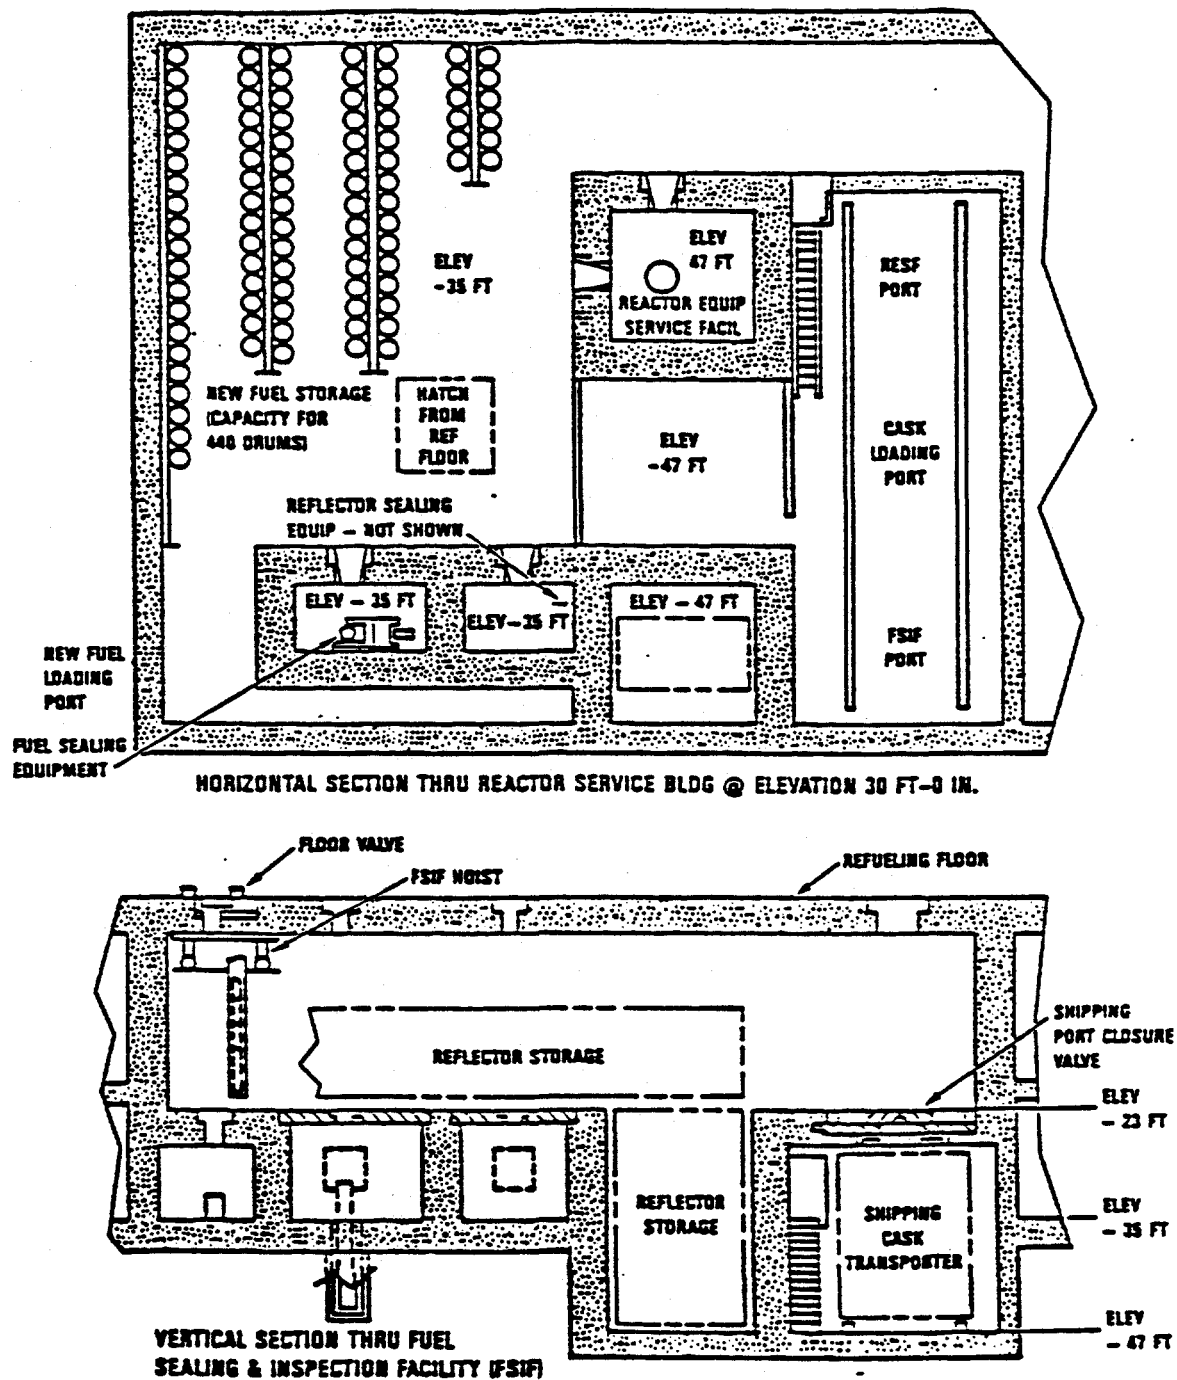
SITE FUEL HANDLING - REACTOR SERVICE BUILDING
